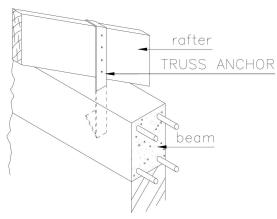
RAFTERS ON MASONRY WALL (TWO TRUSS ANCHORS SHOULD BE USED FOR EACH RAFTER)
